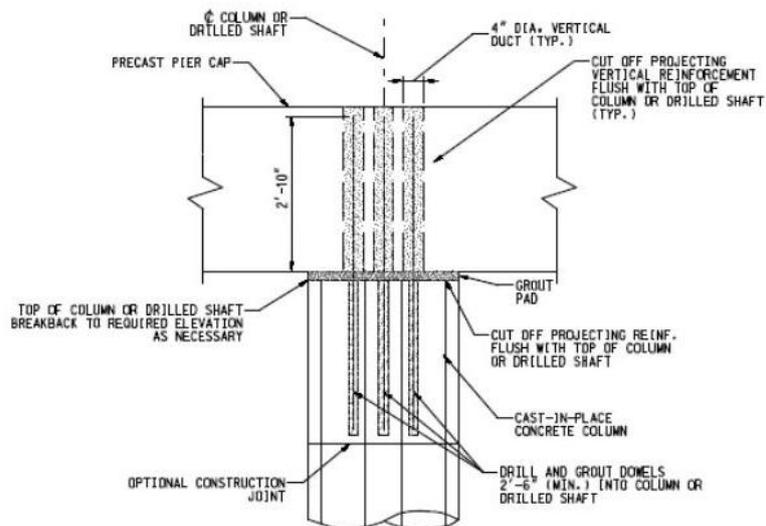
Grouted duct connection detail, courtesy of NCHRP [16].
